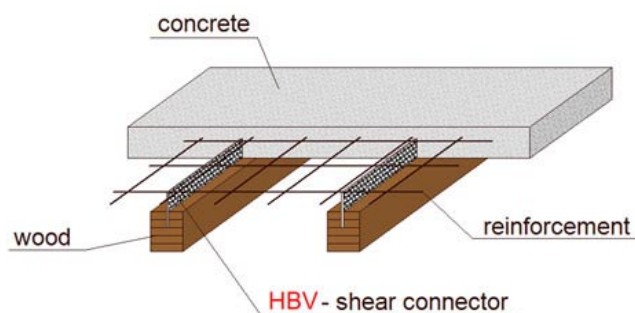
Example of a prefabricated wood-concrete composite floor panels, see [5].
